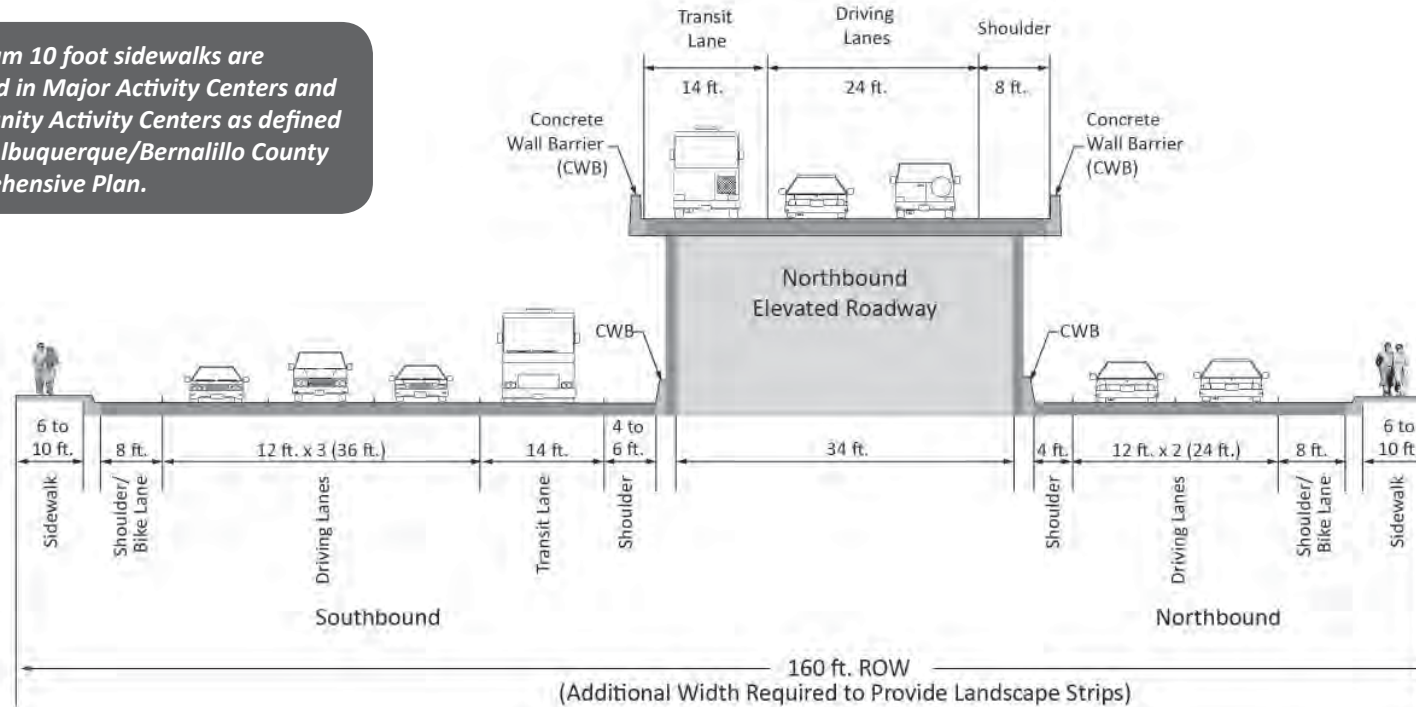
Typical Section of Conceptual Grade-Separated, Elevated Roadway on Coors Boulevard (NM 45) from Quail Road through Sequoia Road
